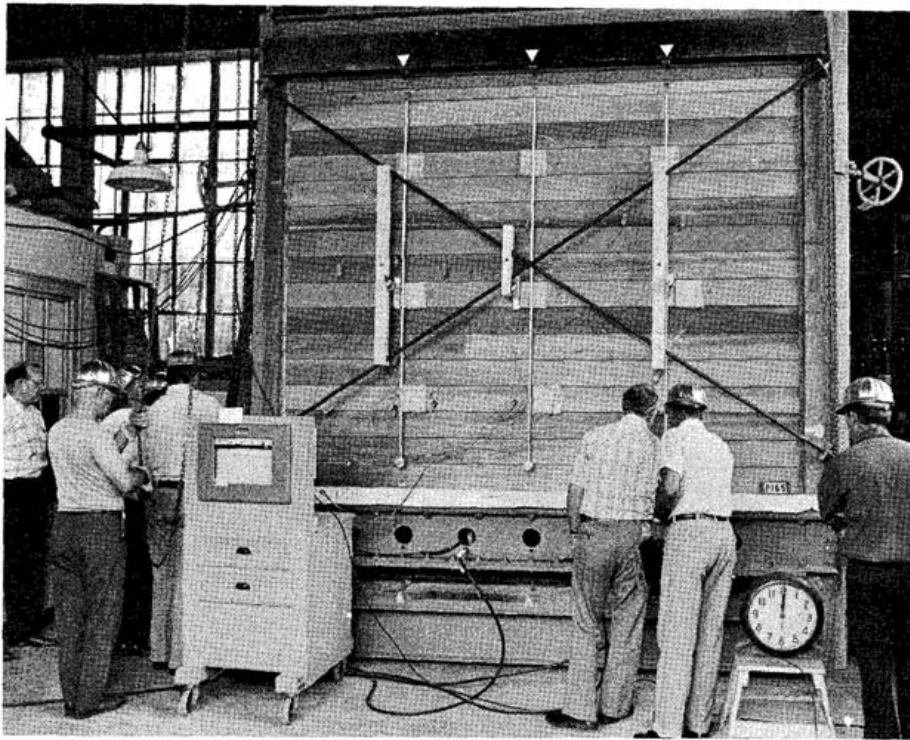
Modified frame, showing new structural steel member supporting the wall panel. The wall panel is in place and ready for the test. M 140 434-7
